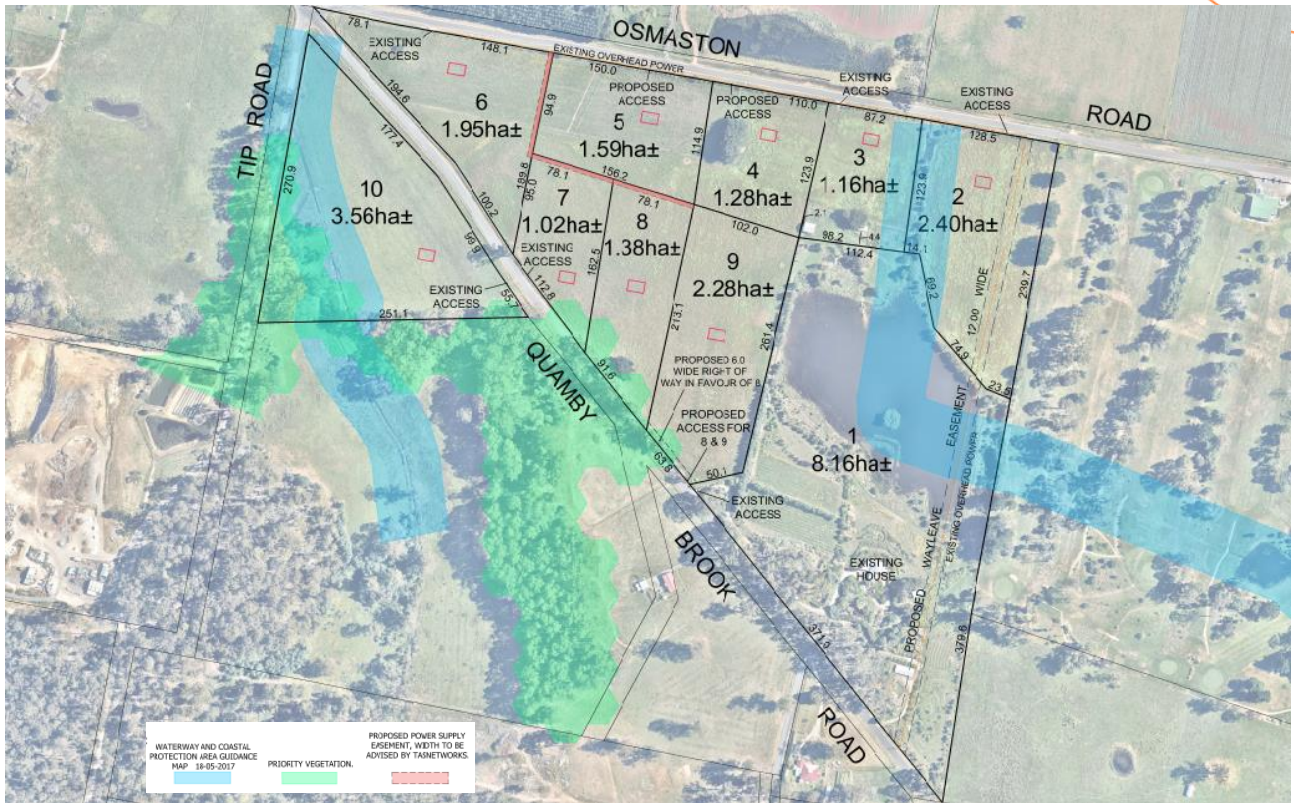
Proposed Subdivision Layout (Extracted from project drawings)
